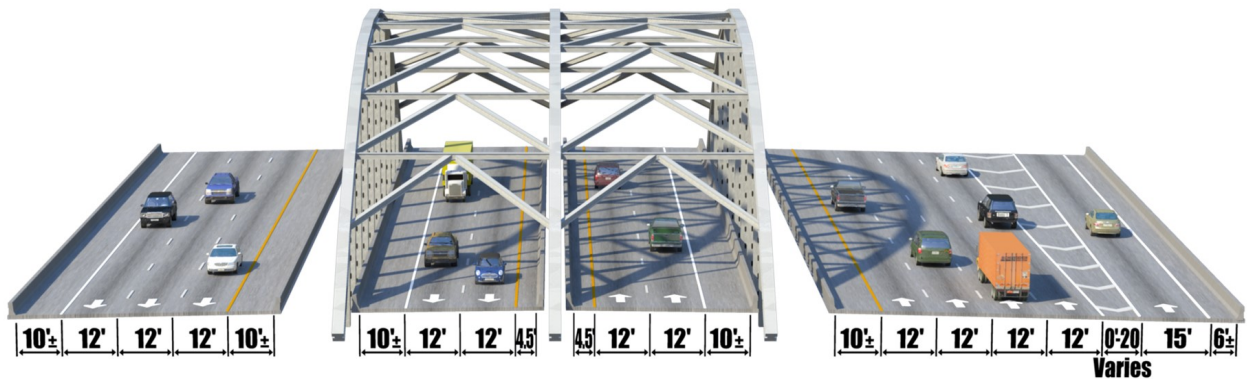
Existing Typical Section at Myrtle Ave Overpass, looking north
